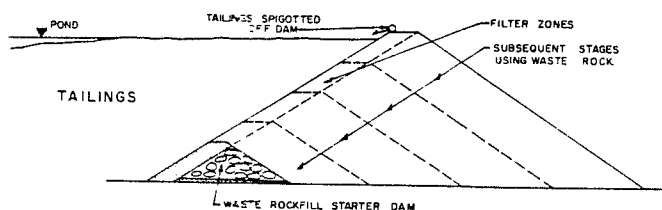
Semi-pervious Tailings Dam Constructed Using Waste Rock
